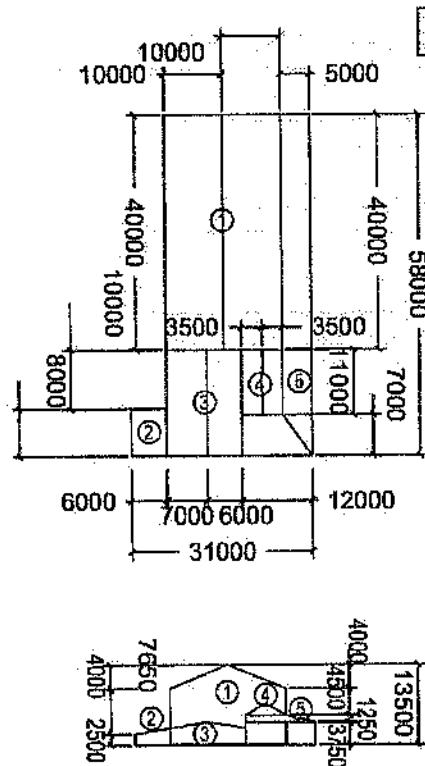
Plan and typical elevation for generating station (BLDG 676)
